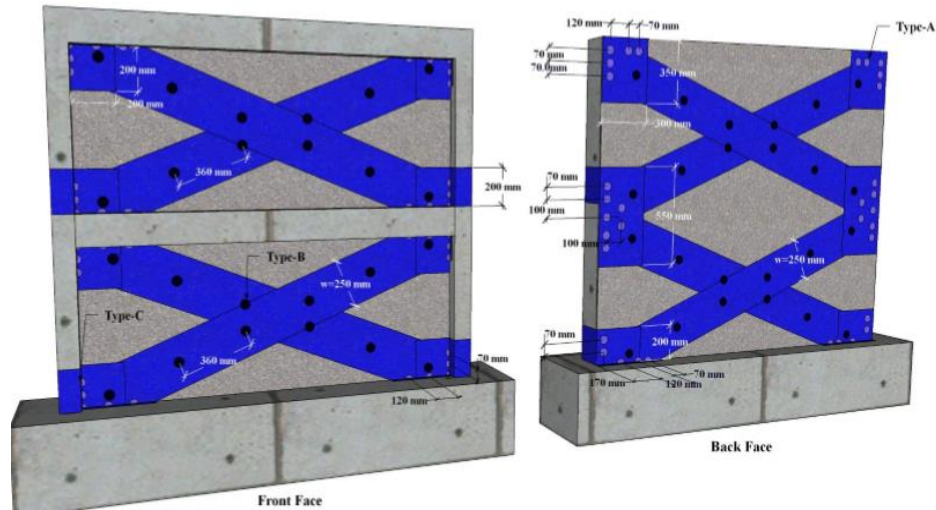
Strengthening of brick infilled walls with CFRP strips (Akın, 2011)
